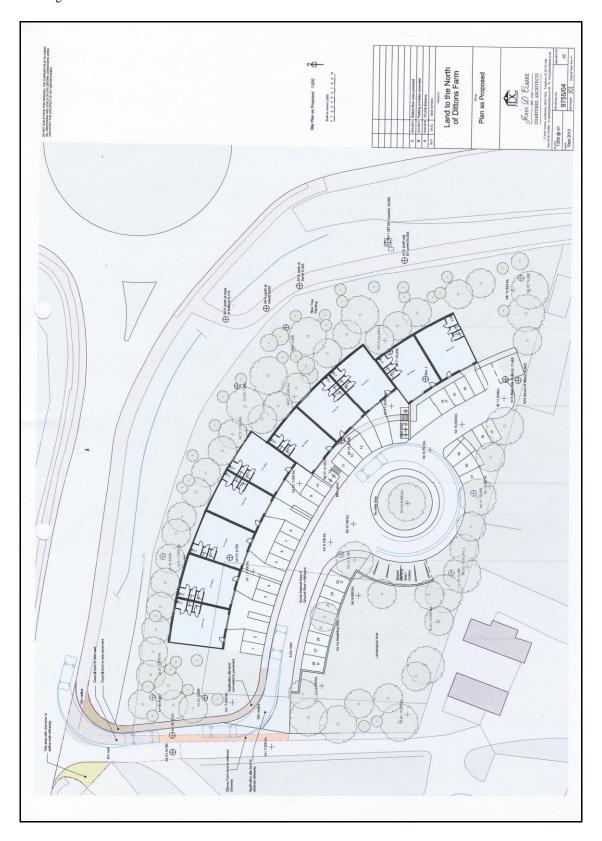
Land north of Dittons Farm: Site development (Adapted from architects drawing)
